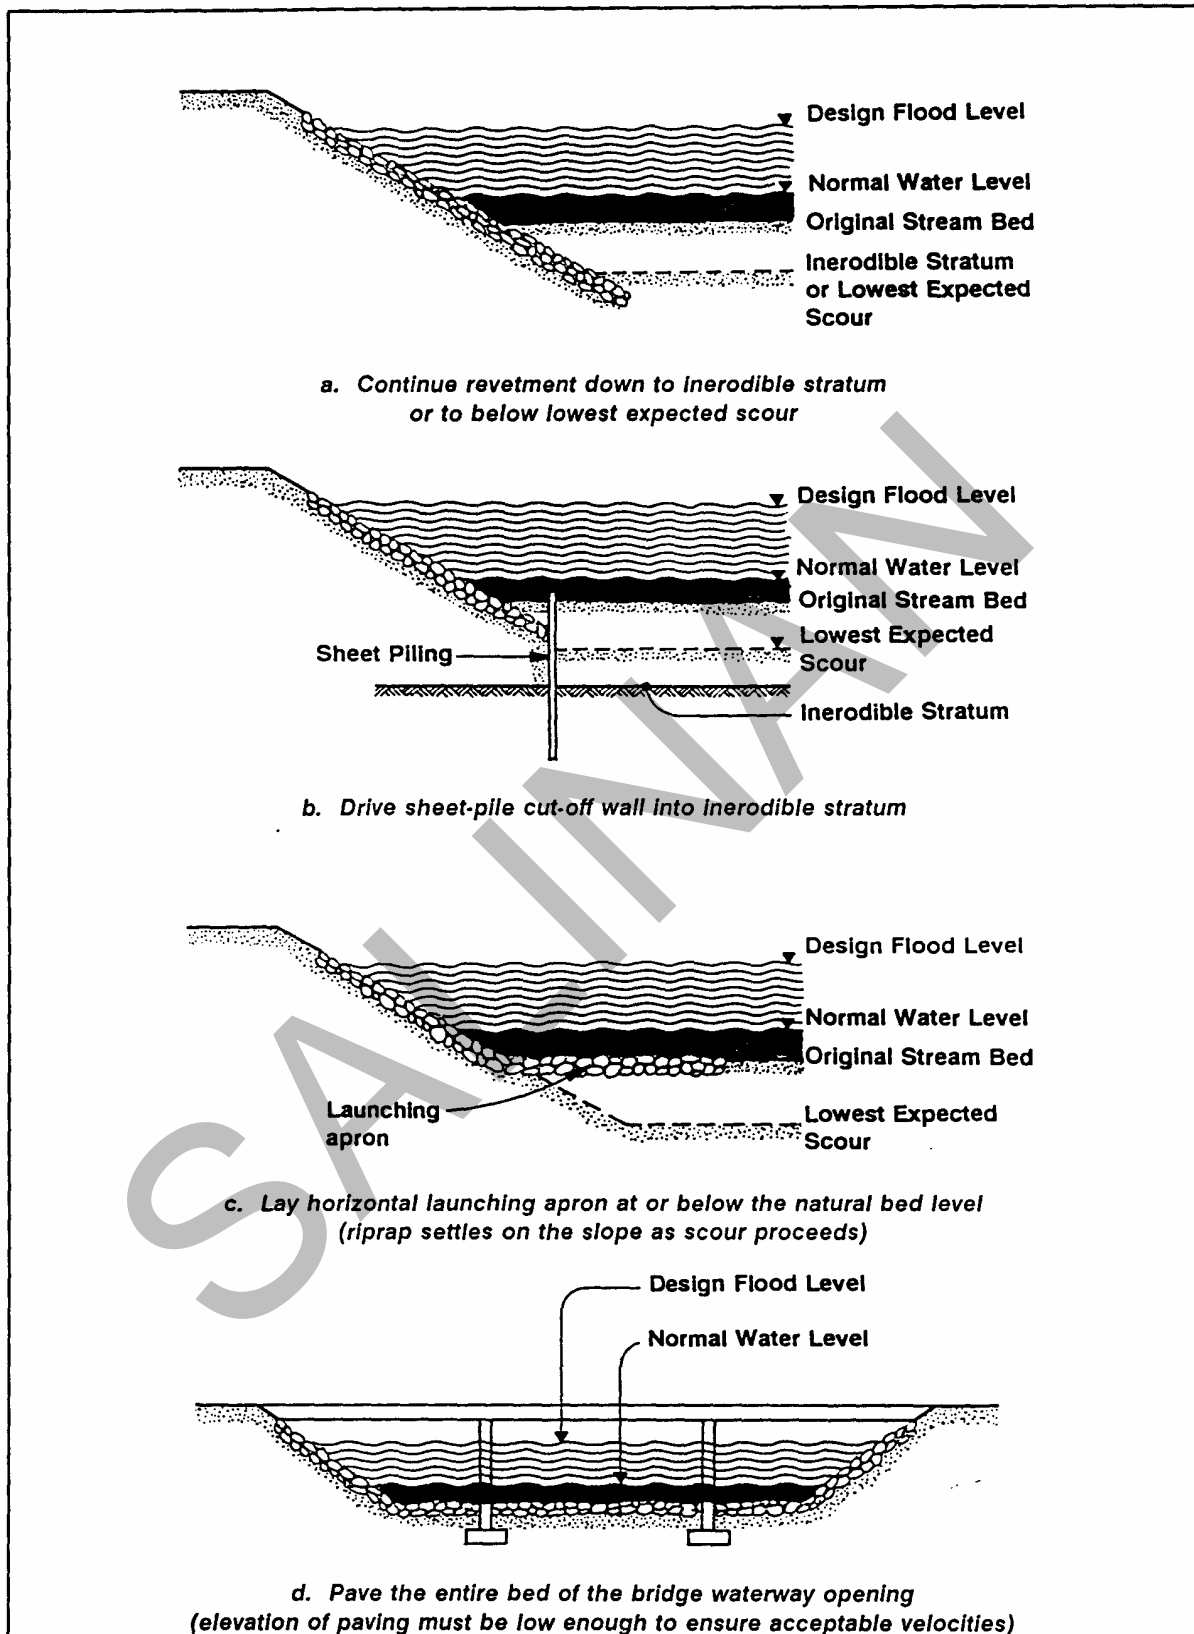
Methods of Protecting Bank Revetment Against Undermining
